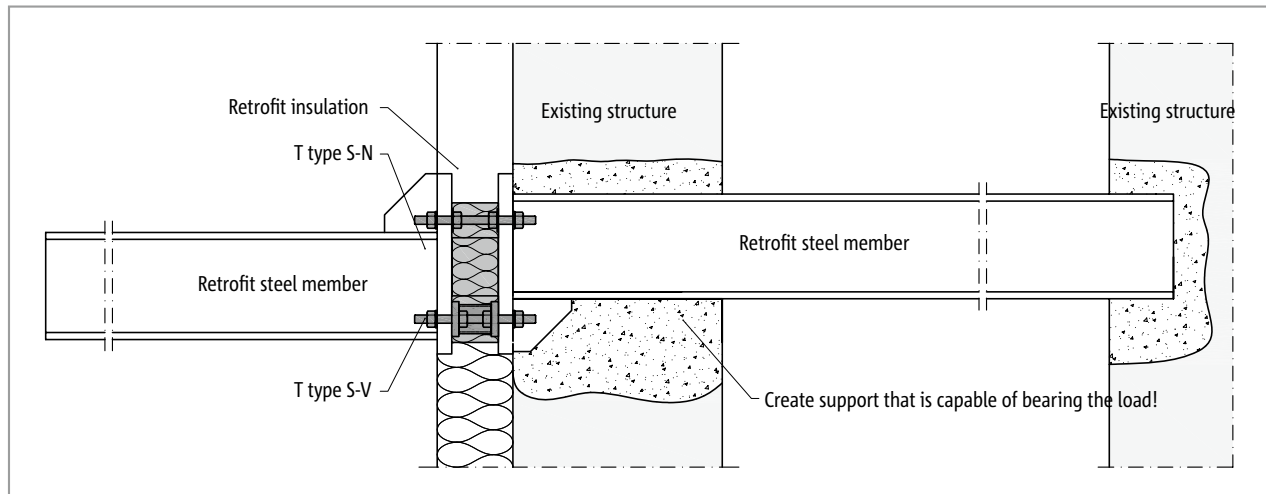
Schöck Isokorb® T type S-N and T type S-V: Retrofitted cantilevered steel balcony connected with height offset retrofitted steel beam
